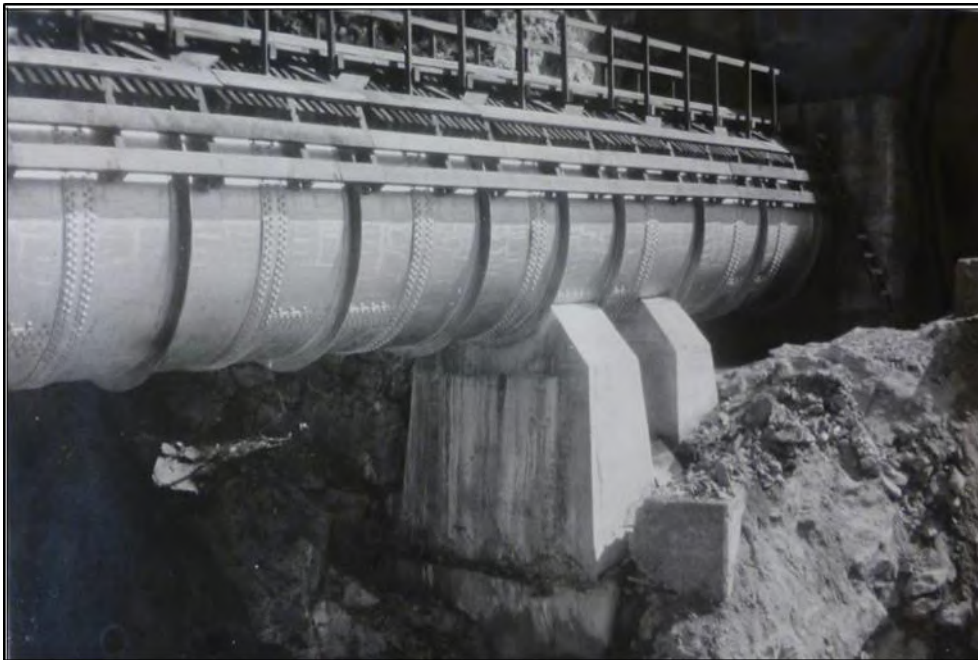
May 1925 riveted pipe segment of Mountain Tunnel and poured-in-place concrete piers at South Fork (JRP 2015).
